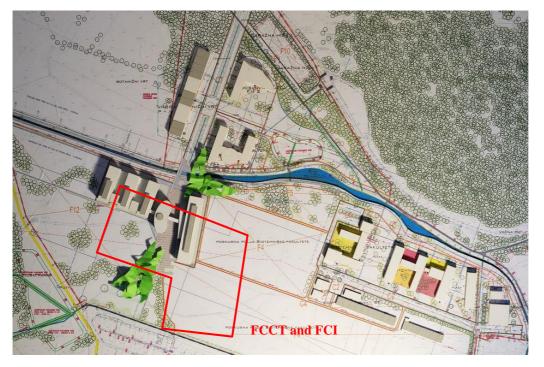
Simulation of the new buildings (source: 4M architects, 2006)
